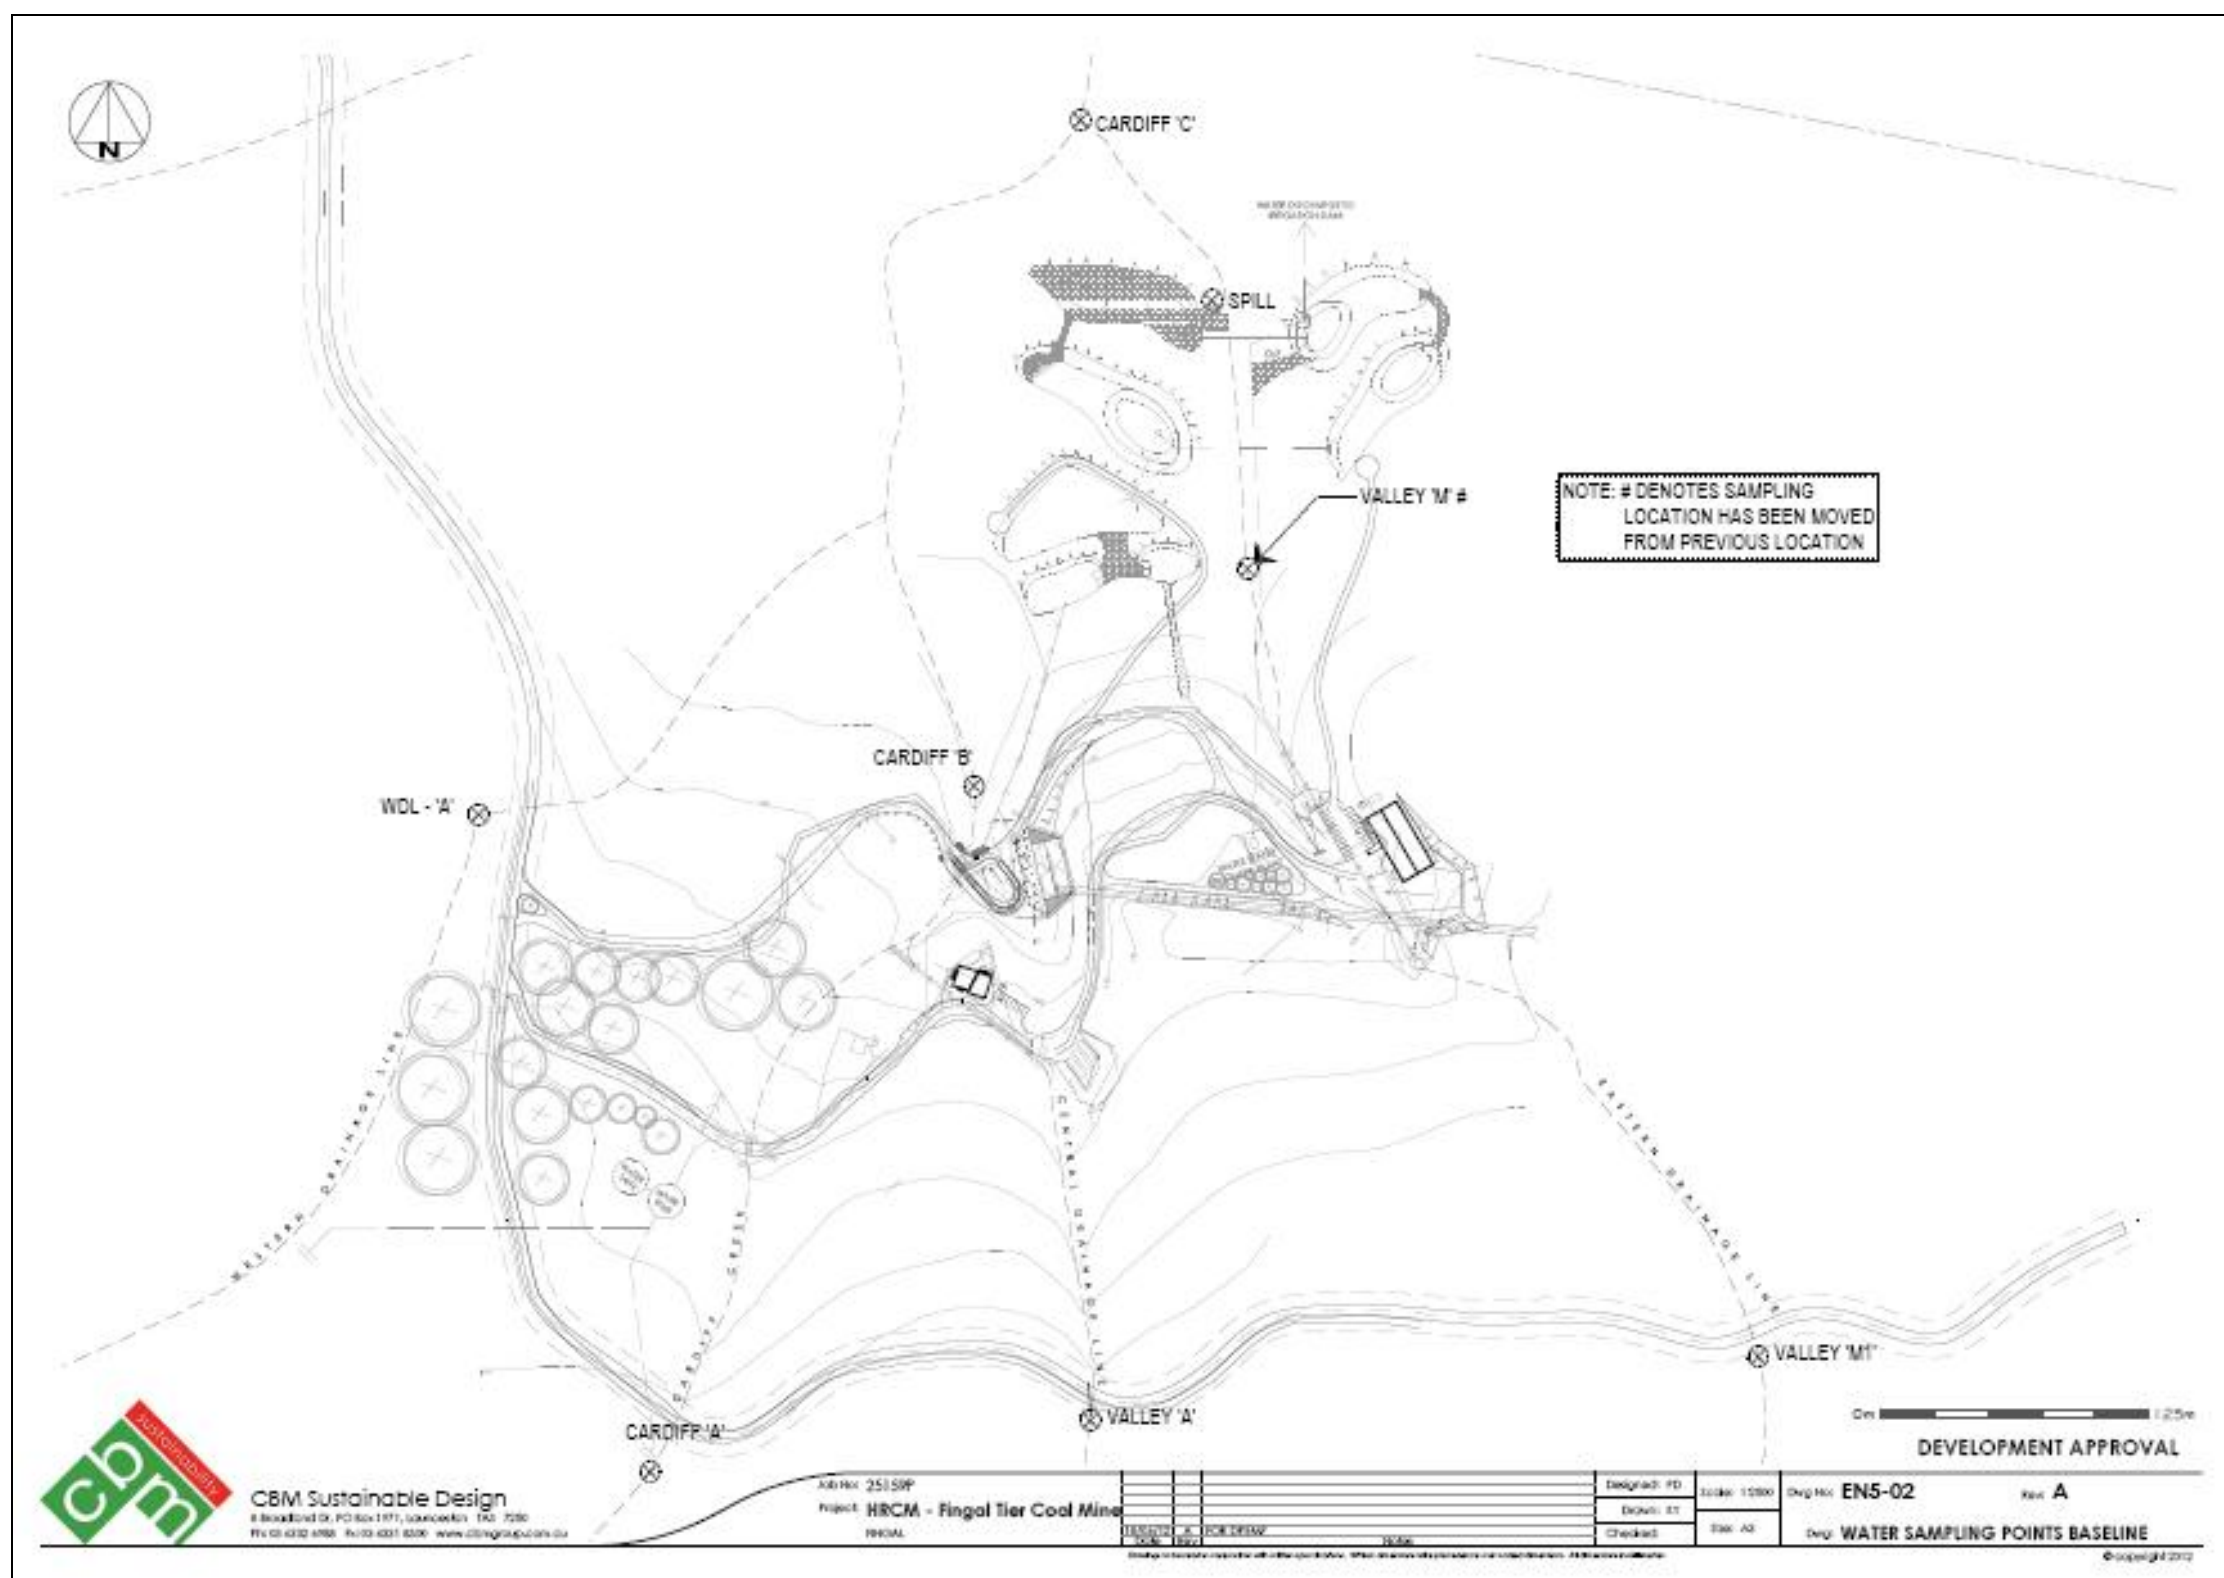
Existing surface water drainage, proposed surface water sampling sites
